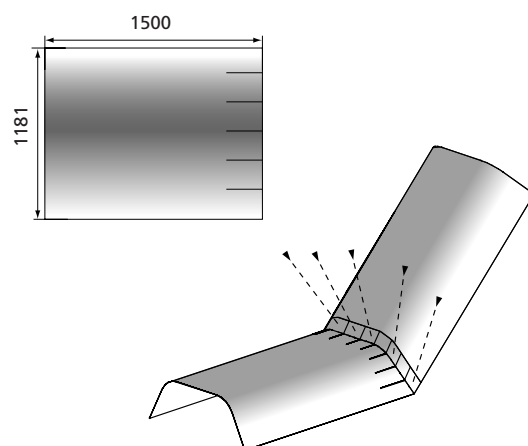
Assembling the insulating plate on the vertical bends in the strip
